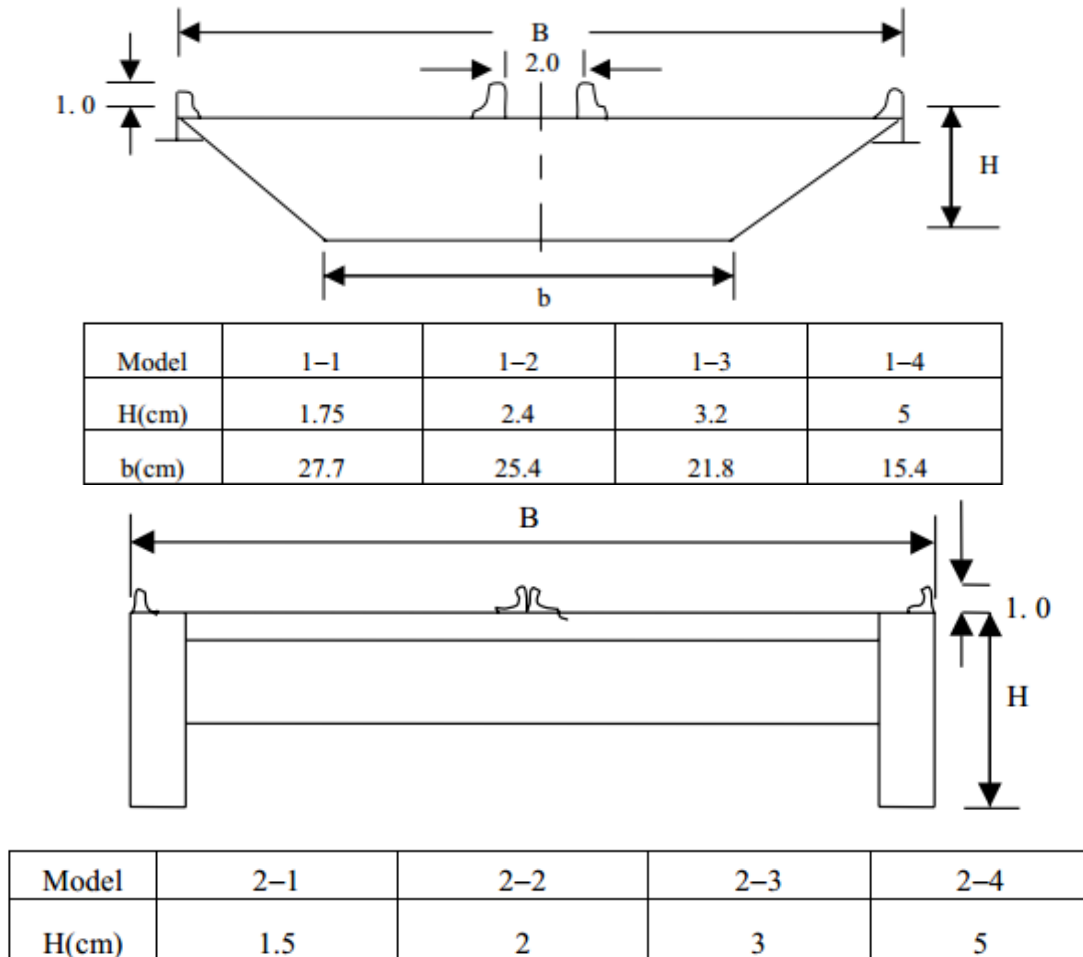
Geometry (closed box girder and plate girder) of section models [56]
